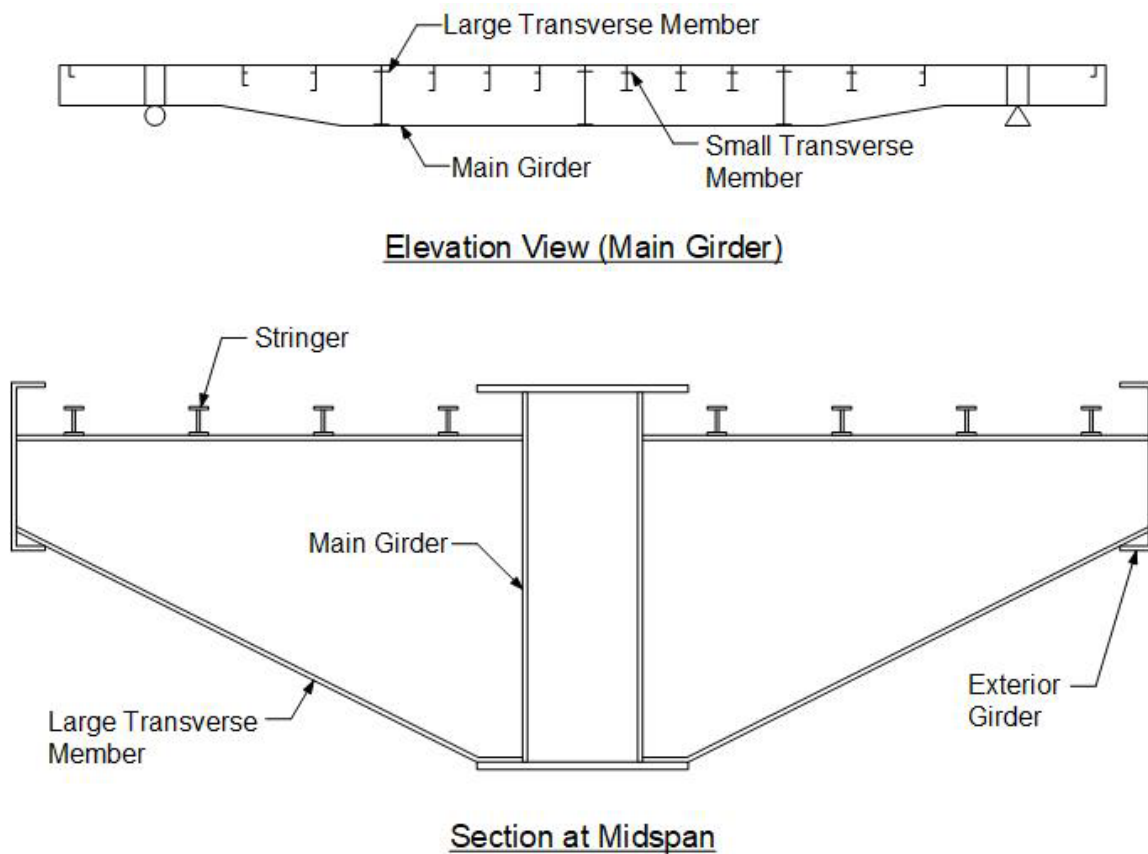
Elevation and Cross Section of a Railroad Flat Car Bridge
